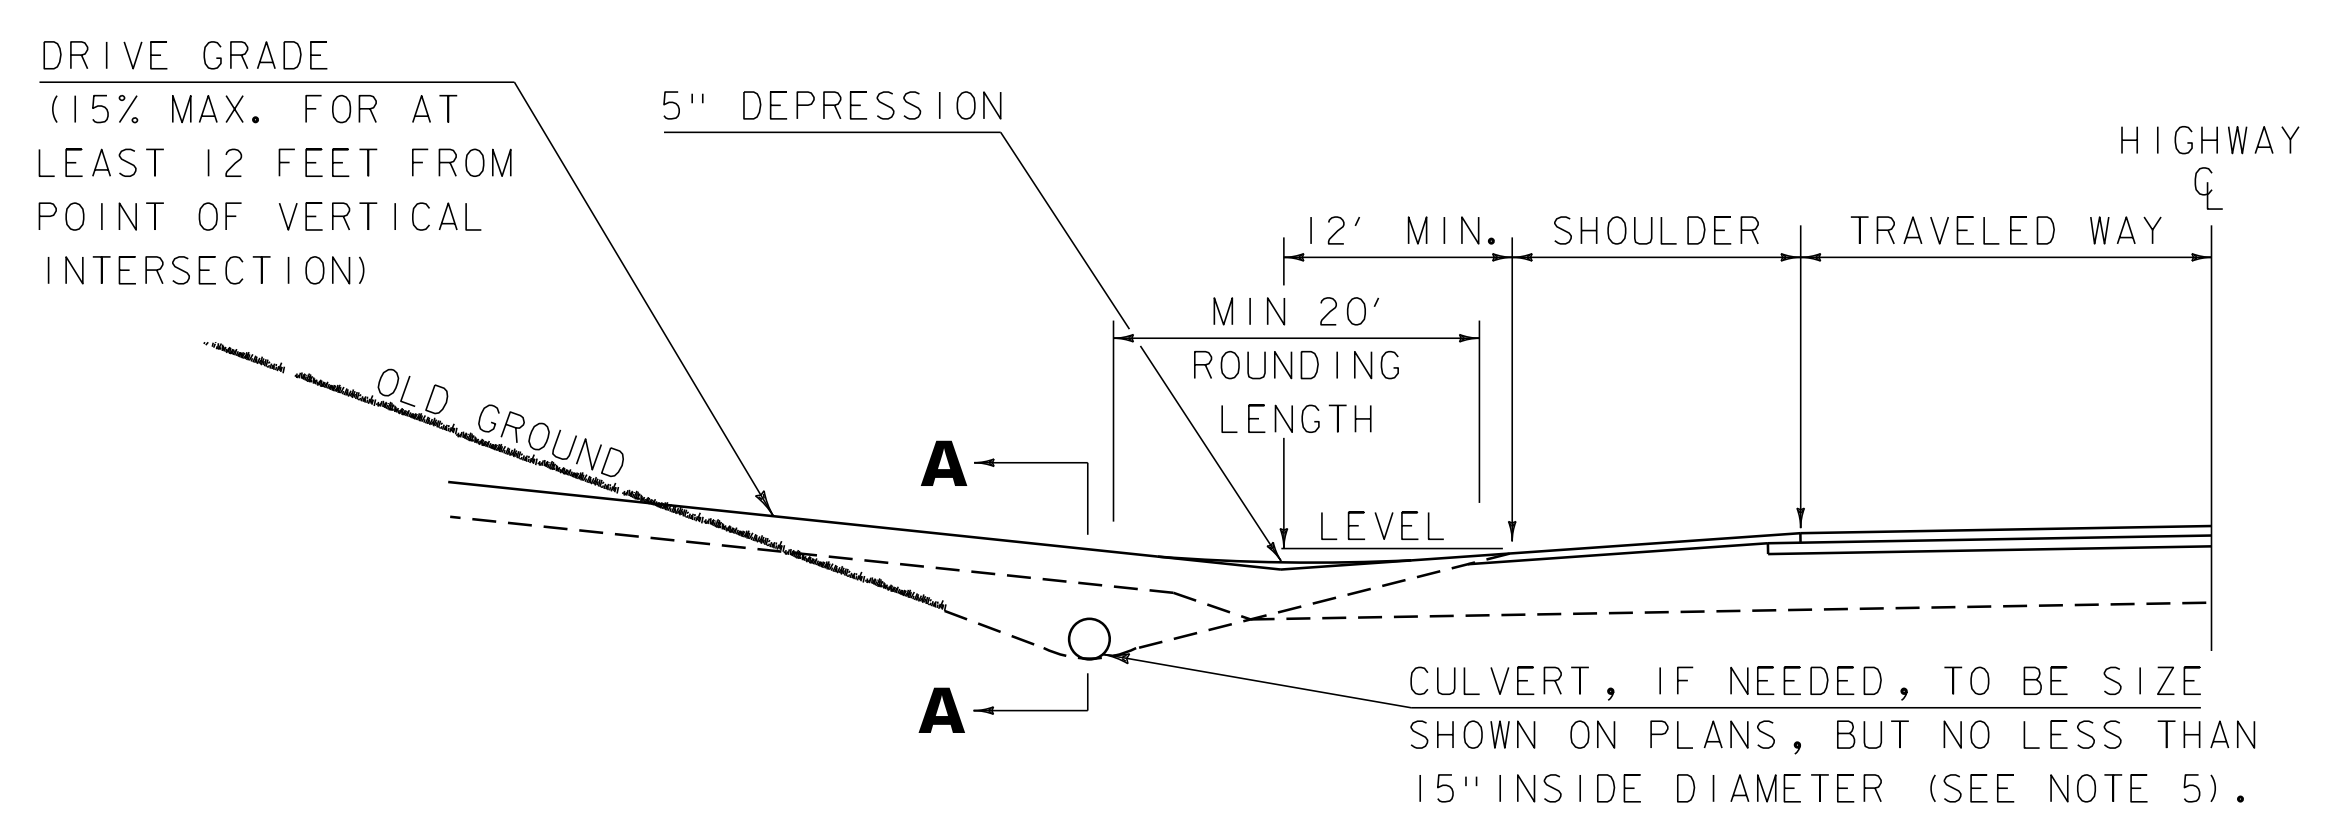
DETAIL B PROFILE OF DRIVE INTERSECTION (FILL SECTION)
